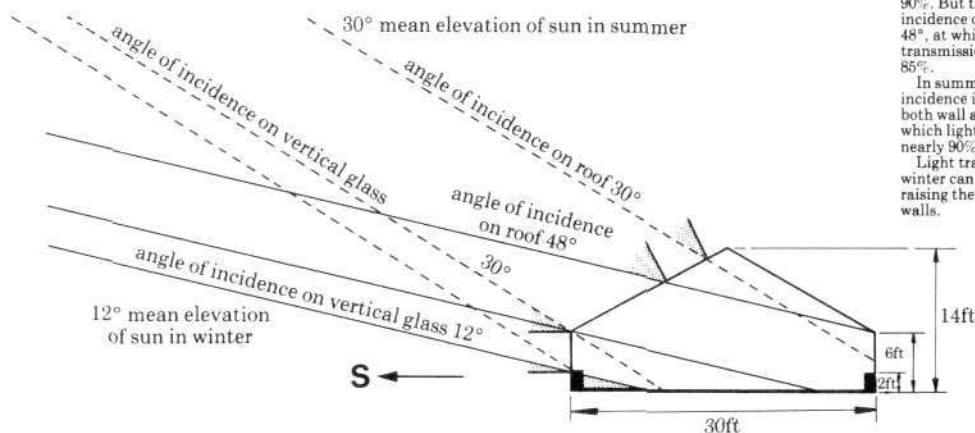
sunlight falling on a vinery-style greenhouse oriented east-west.
